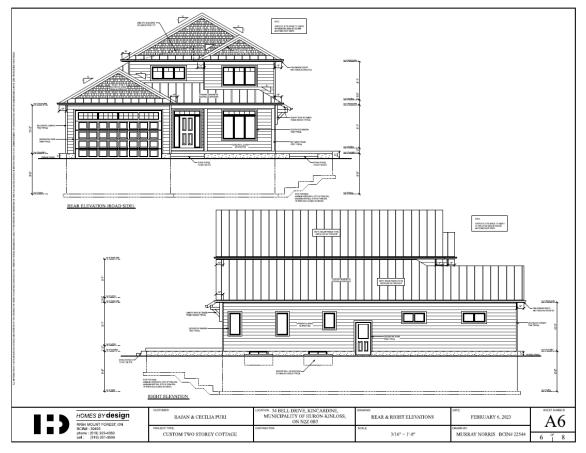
Proposed Two-Story House – Elevation Plans (2023)
